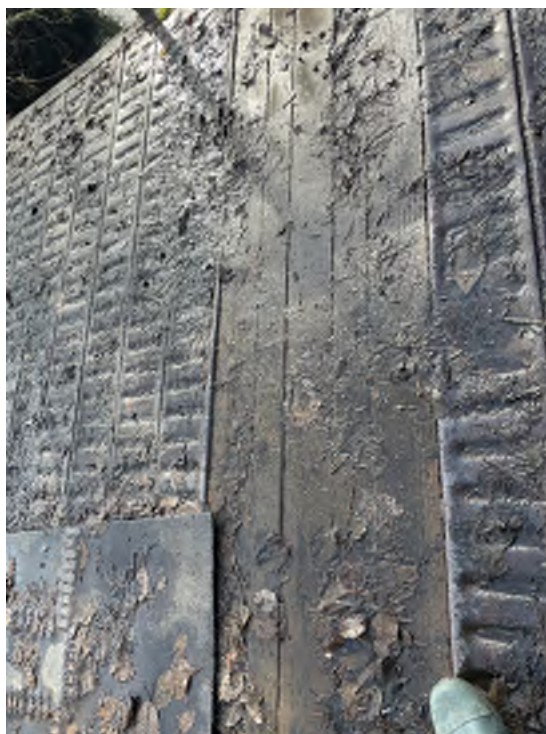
Gordy Jolma No 5 Corrosion/damage on steel deck plate and timber deck plank section.
